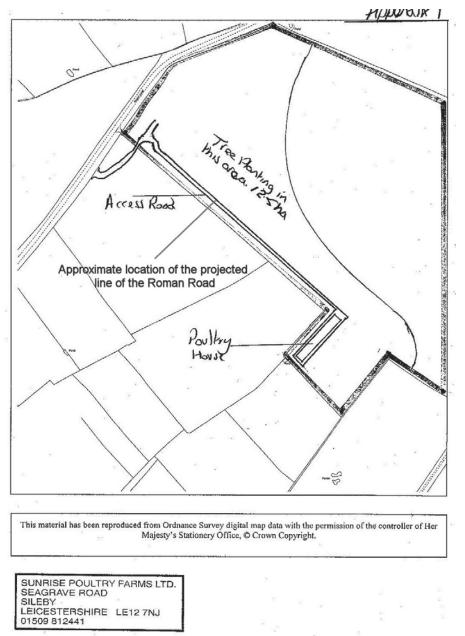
Site layout for poultry houses and access road and the location of the projected line of the Roman Road (plans supplied by client)
